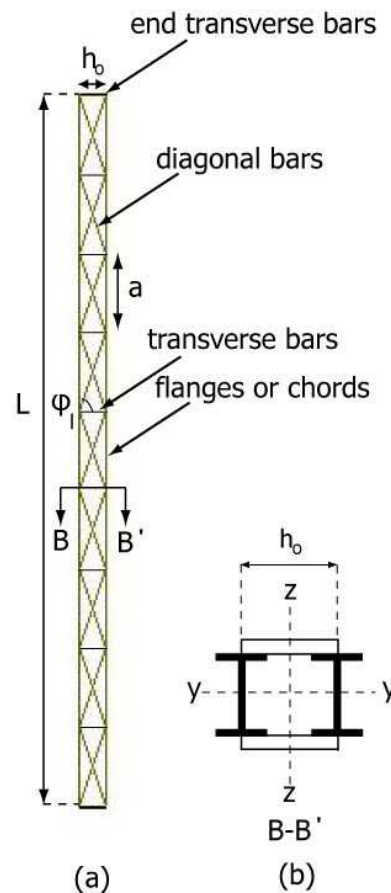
(a) Typical laced built-up column and (b) its cross-section B-B'
